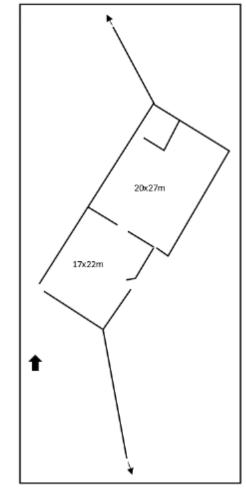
Plan of the kraal at waypoint 110 in HL02.
